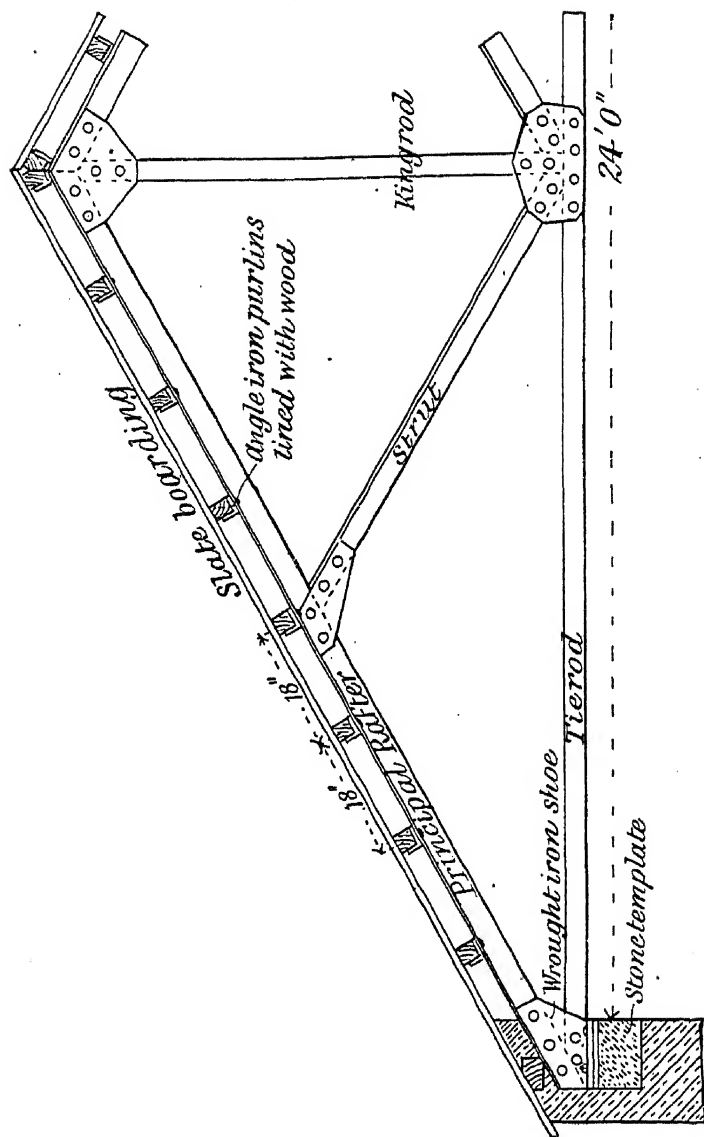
Part Elevation of an Iron Roof Truss for a 24' Span.
